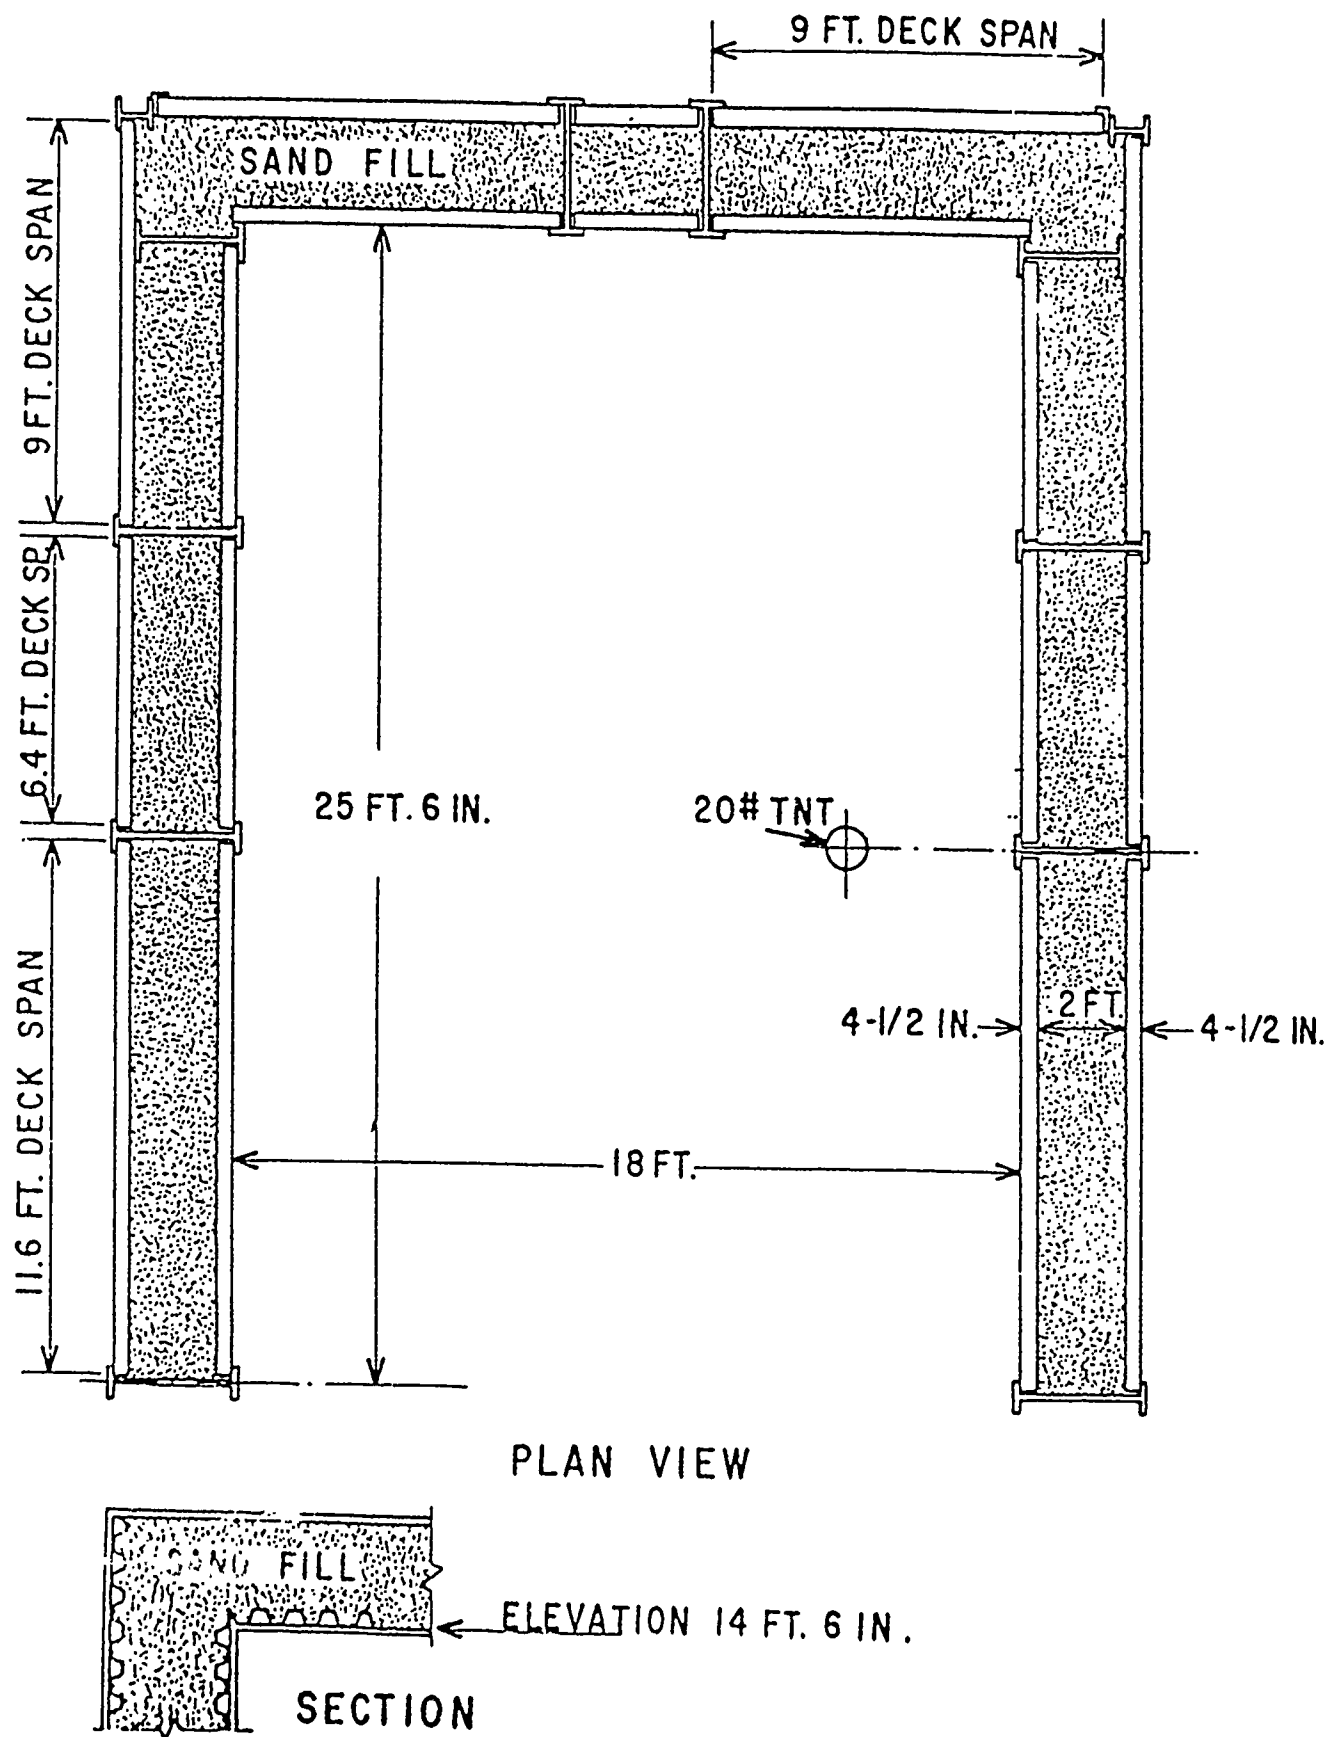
Cross-Section of Box-Shaped Double-Walled Barricade
